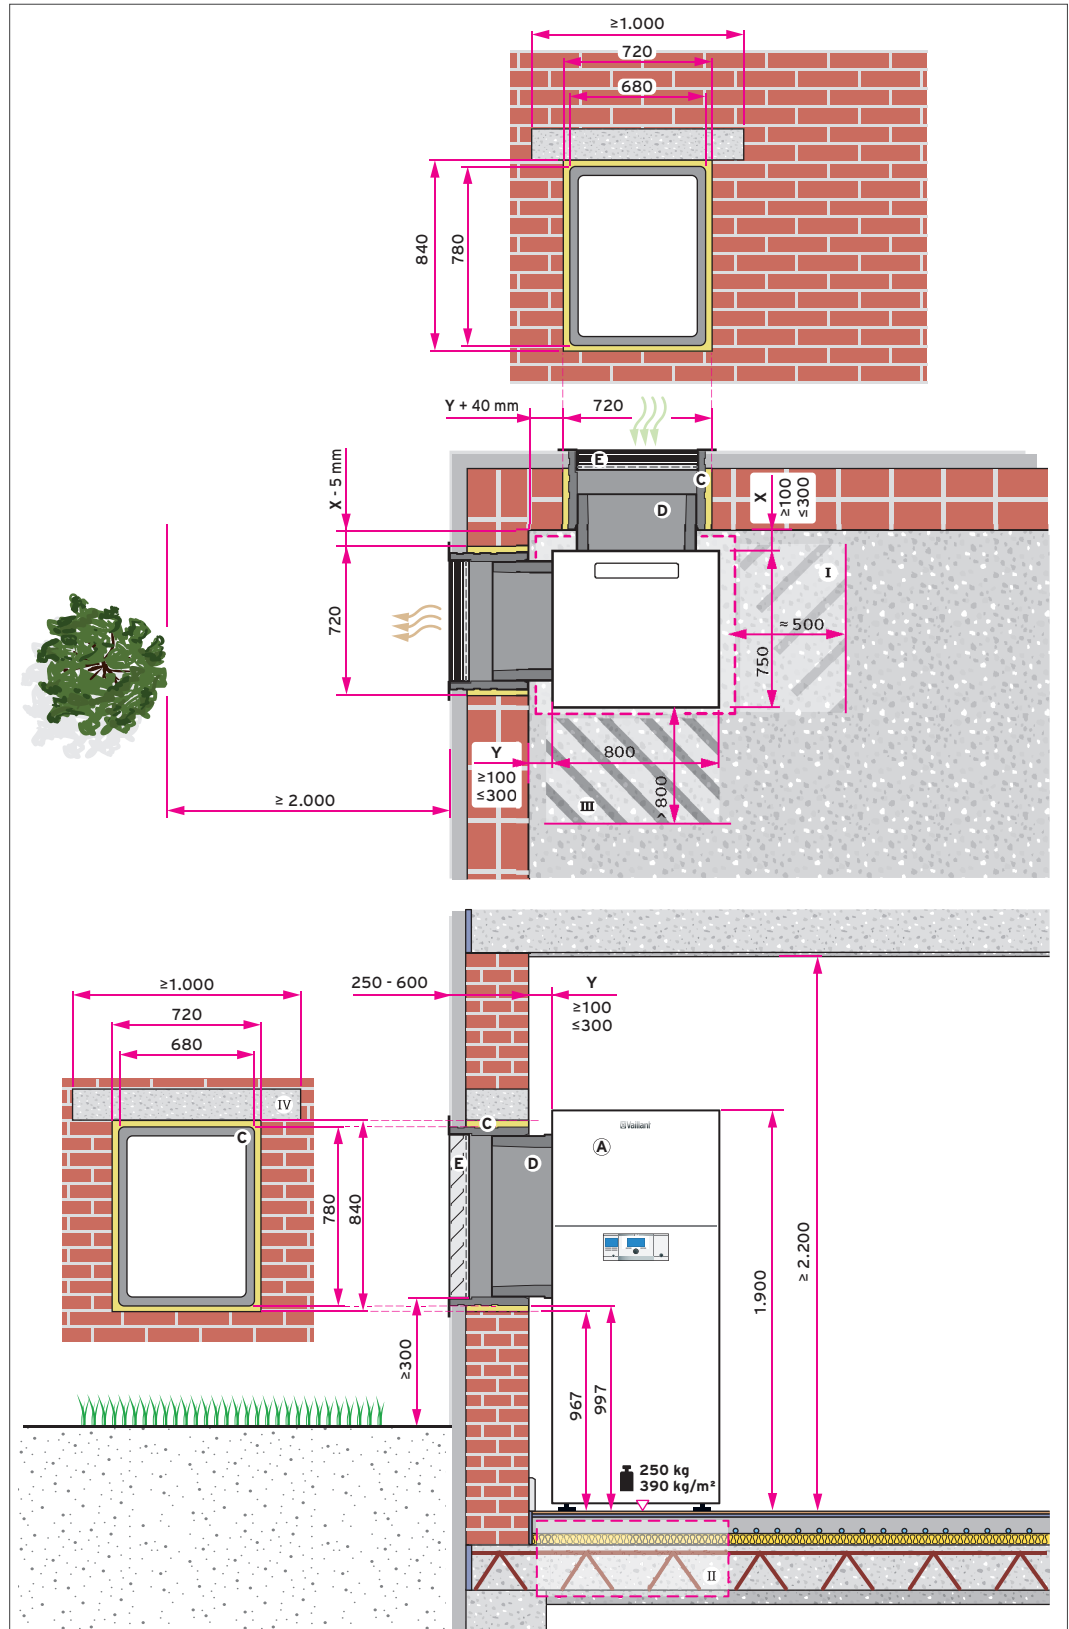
versOTHERM installation situation, ground floor - left-hand installation in the corner of a room
